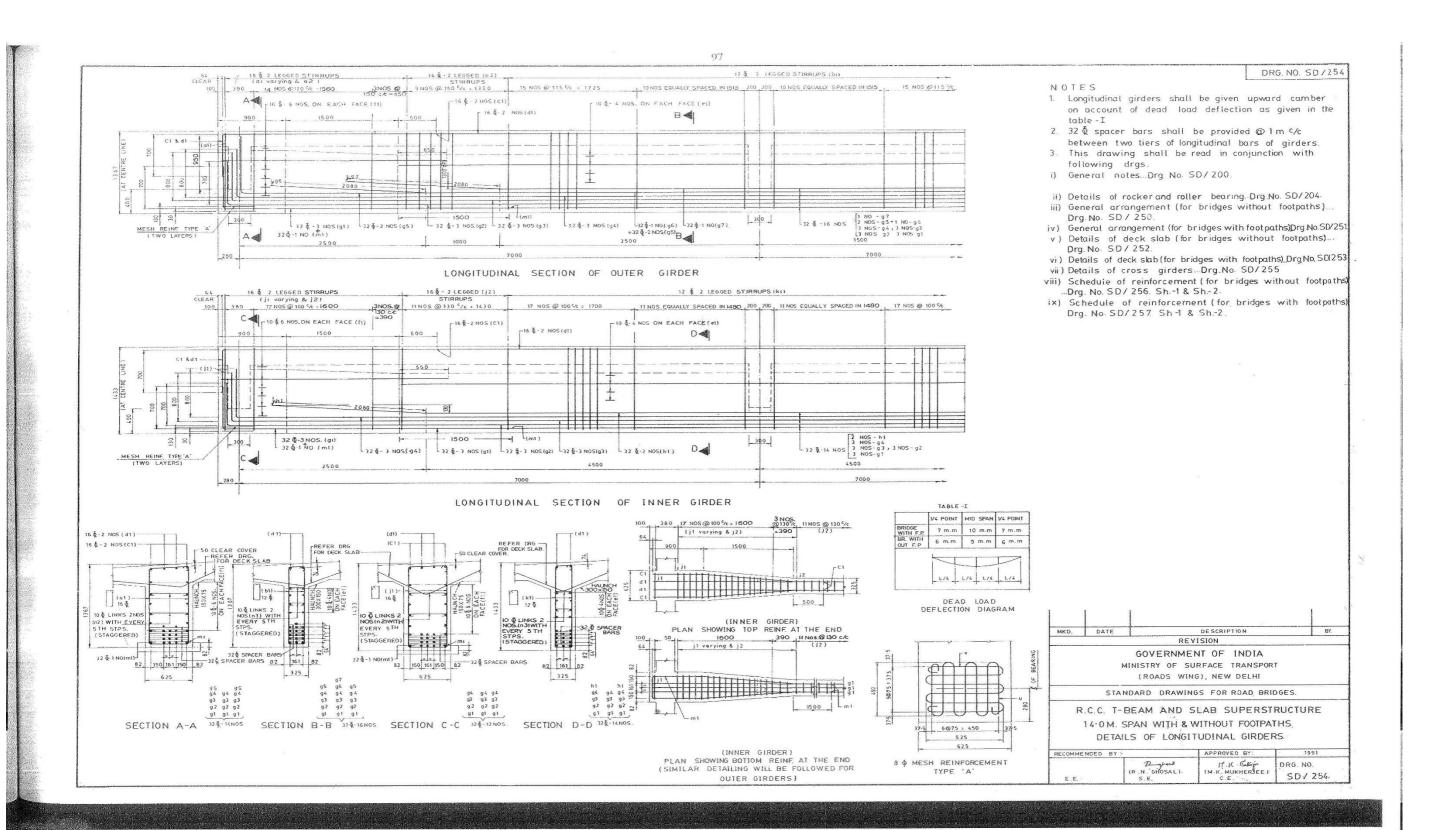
Details of Longitudinal Girder (with Foot Paths)-Drawing No. SD/254
